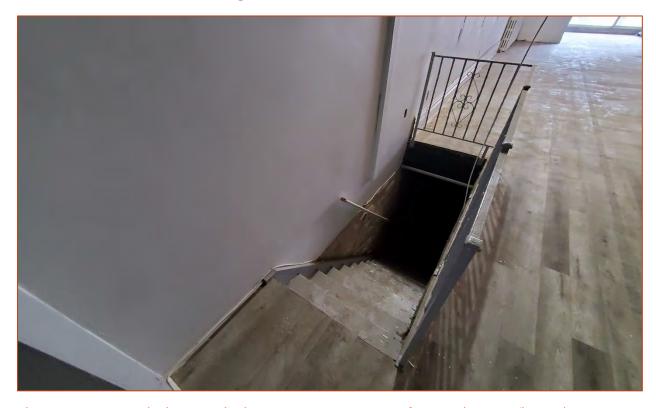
View south showing the basement stairway Kept for now (context/layout)
